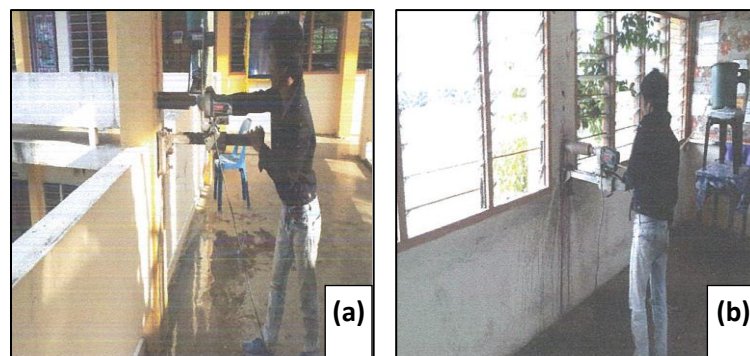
Obtaining concrete cored sample by core drilling on column at corridor (a) and at classroom (b).
